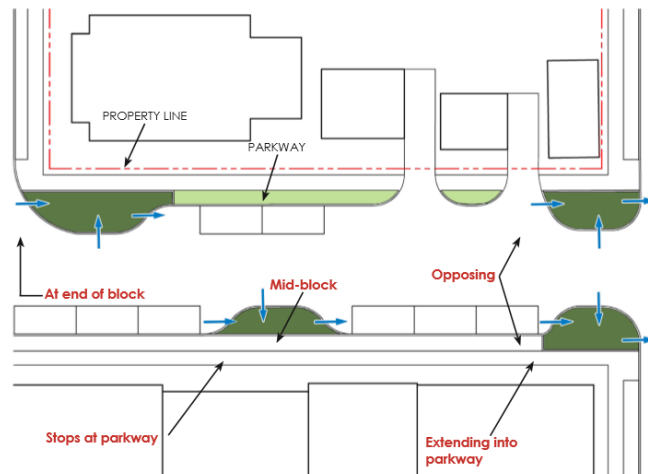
Vegetated curb extension Bump outs (Source: Wise, 2008).
